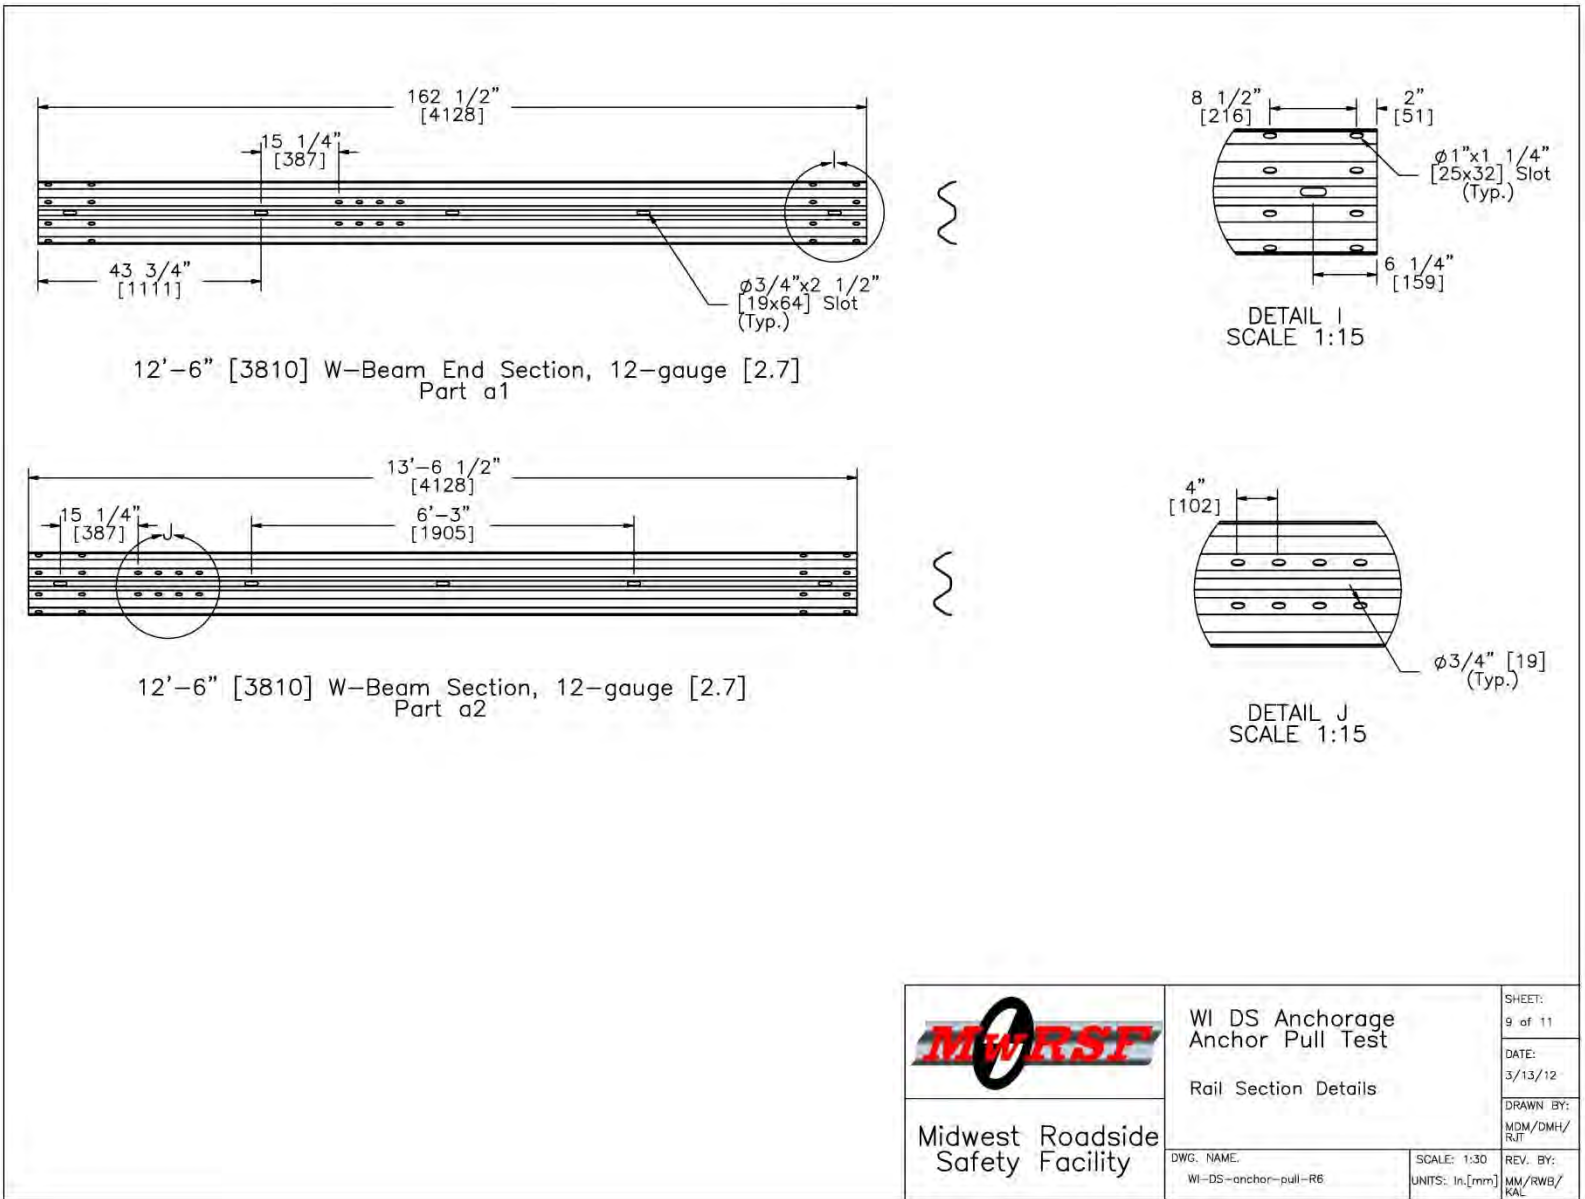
Rail Section Details, Test Nos. DSAP-1 and DSAP-2
